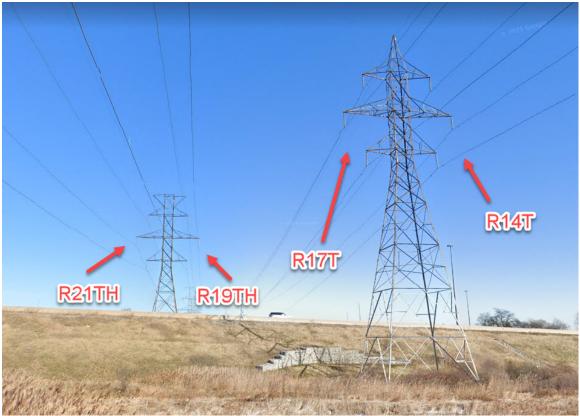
Figure A: Existing Tower and Circuit Facilities (Photograph taken face east towards Toronto)
